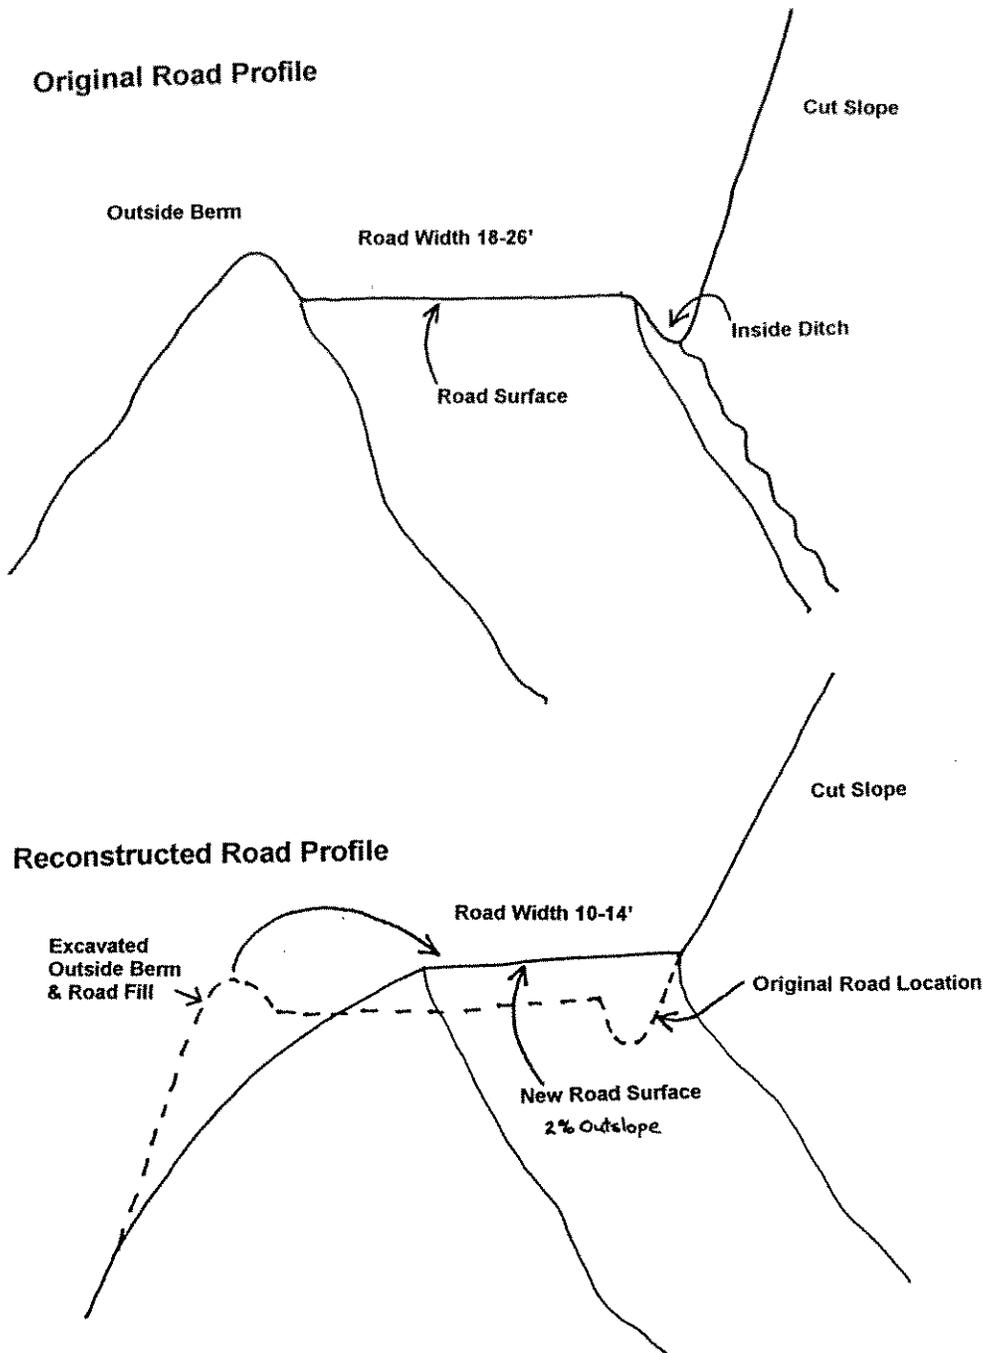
This illustration shows a typical road profile before and after reconstruction. The original road has an inside ditch and an outside berm. In reconstruction the inside ditch and outside road berm are eliminated. Outside berm and road fill material is excavated and placed to create a new road base. The end product is a much narrower outsloped road which tends to disperse rather than concentrate water.
